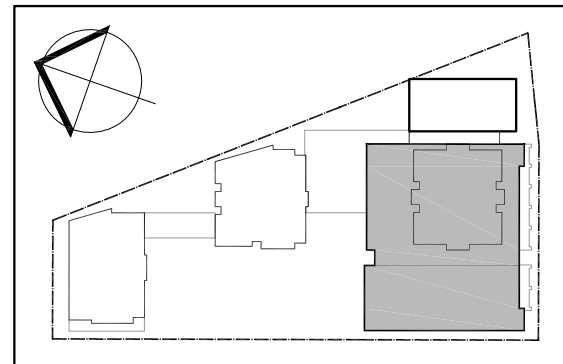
Typical Plan, Office Building (Floors 2 to 6)
